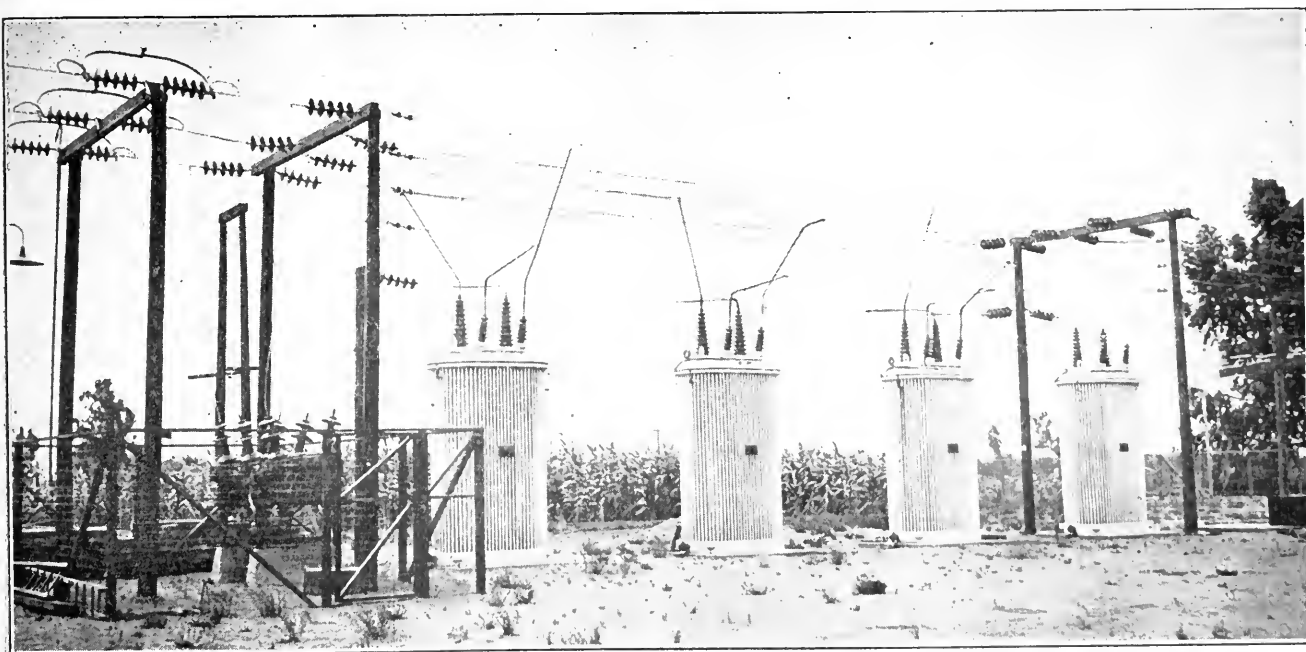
METHOD OF CONNECTING 66-KV. TRANSFORMERS AND OIL SWITCHES WITH BUSBARS
